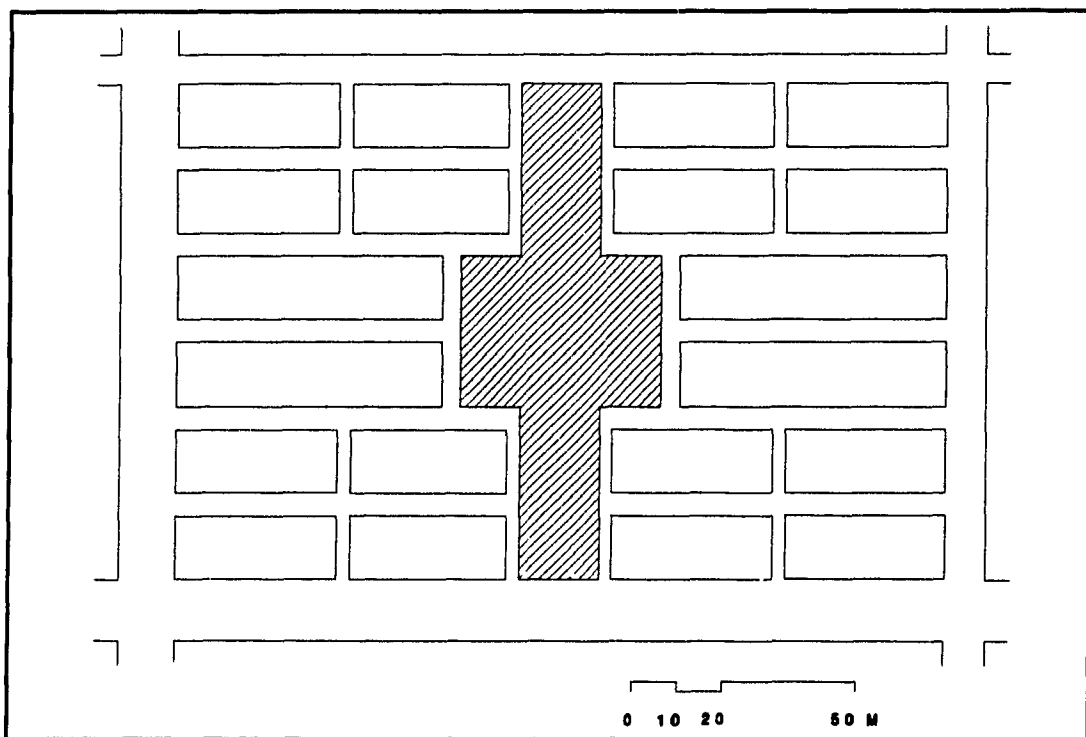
PUBLIC OPEN SPACES - CONTROL PLAN
